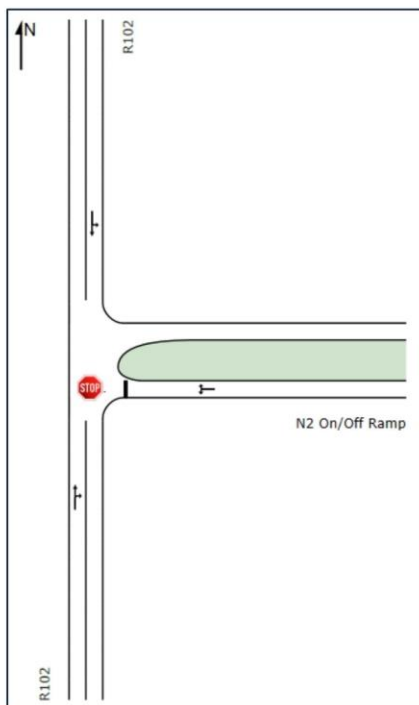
R102 and National Route 2 Northbound Carriageway Ramp Terminal Existing Intersection
